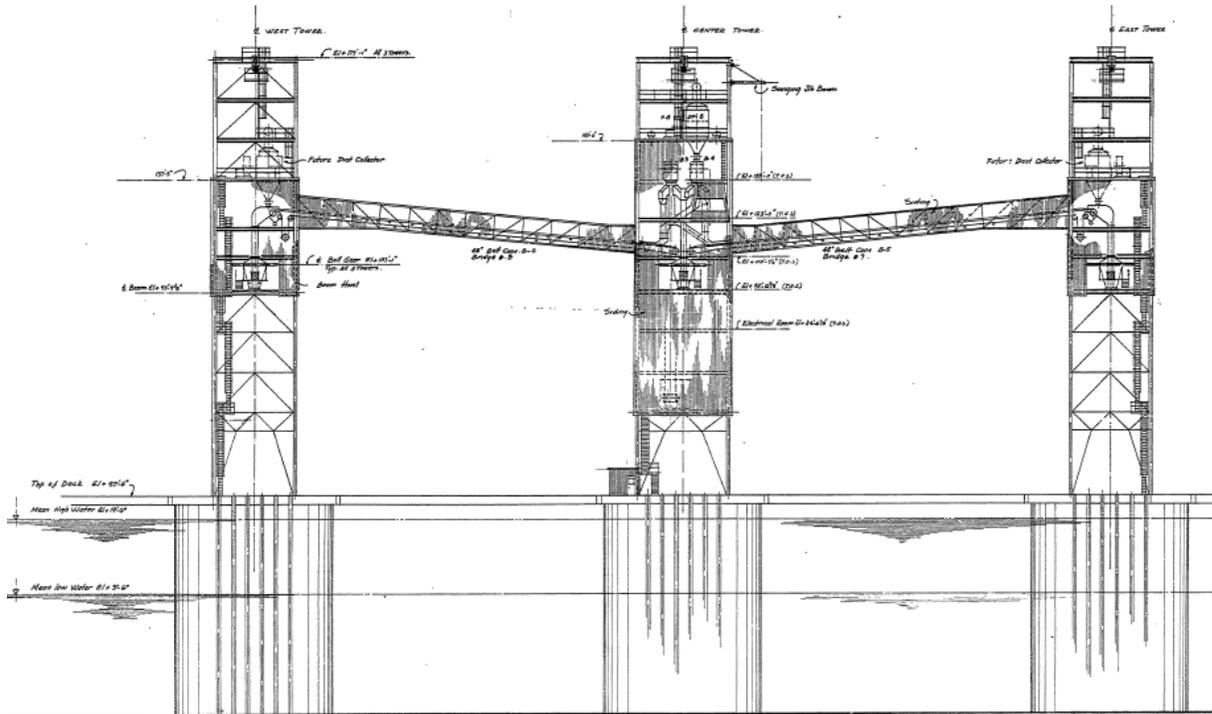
Berth 501 cell structures and shiploader towers elevation
